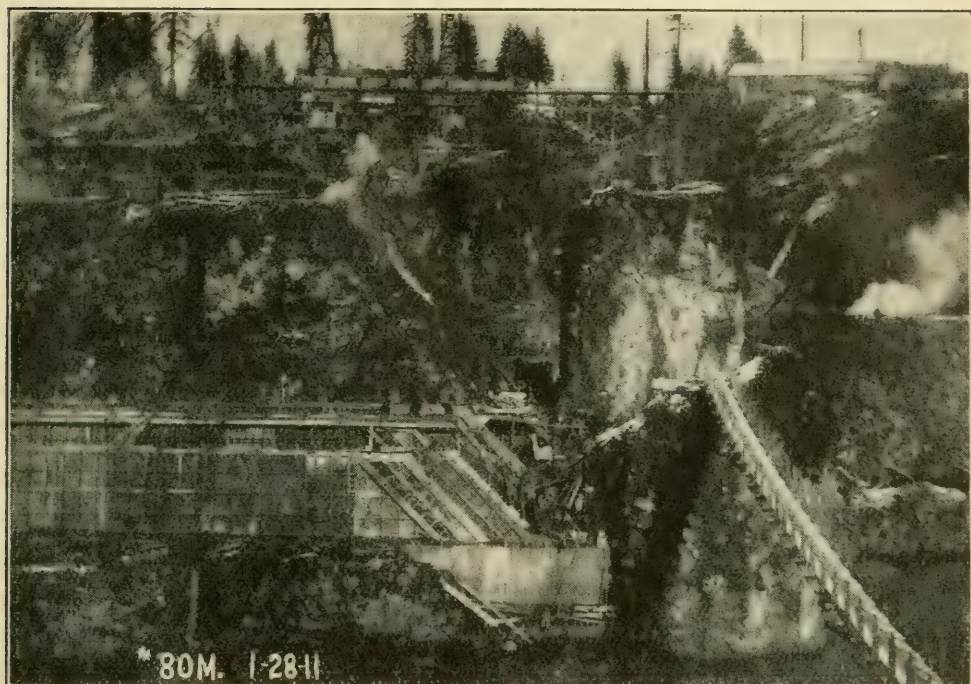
VIEW FROM LEFT BANK. ISLAND BEING CUT TO SLOPE OF DAM.
